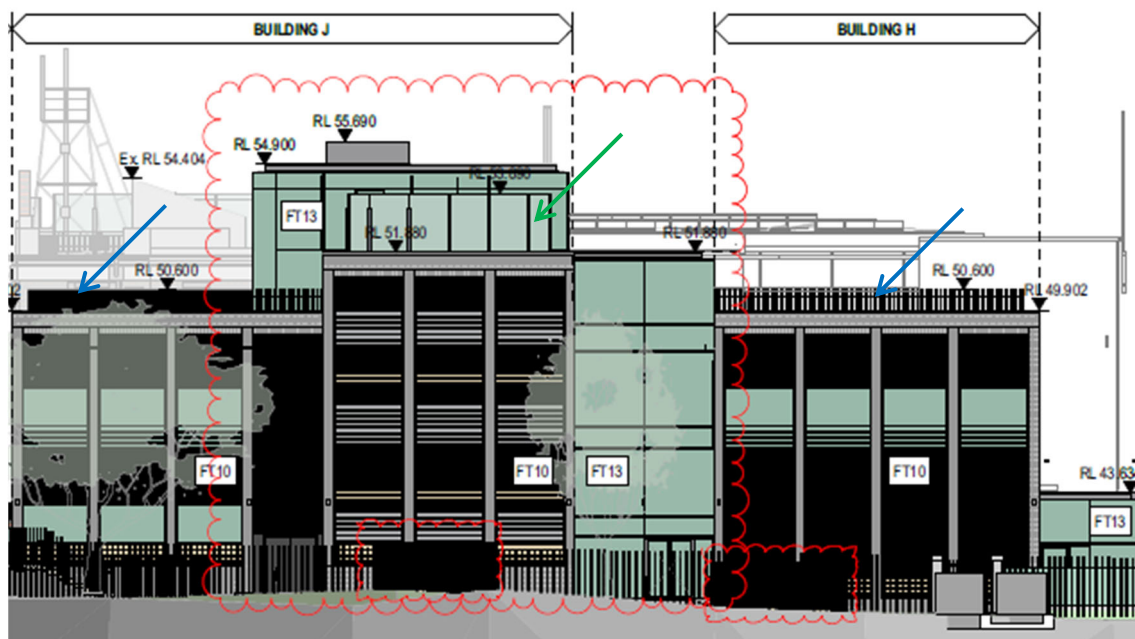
The Assessment Report, with the Safety Protection Structures to Building J & H which comprise palisade balustrade and parapet to the east (Building H) and west (Building J) portions (blue arrow) and a central (Building J) glazed balustrade (green arrow) Figure 36 | Proposed view from the south (Source: SRtS 2021), Modification 1 (SSD-10340-MOD-1) | Modification Assessment Report, p44).
